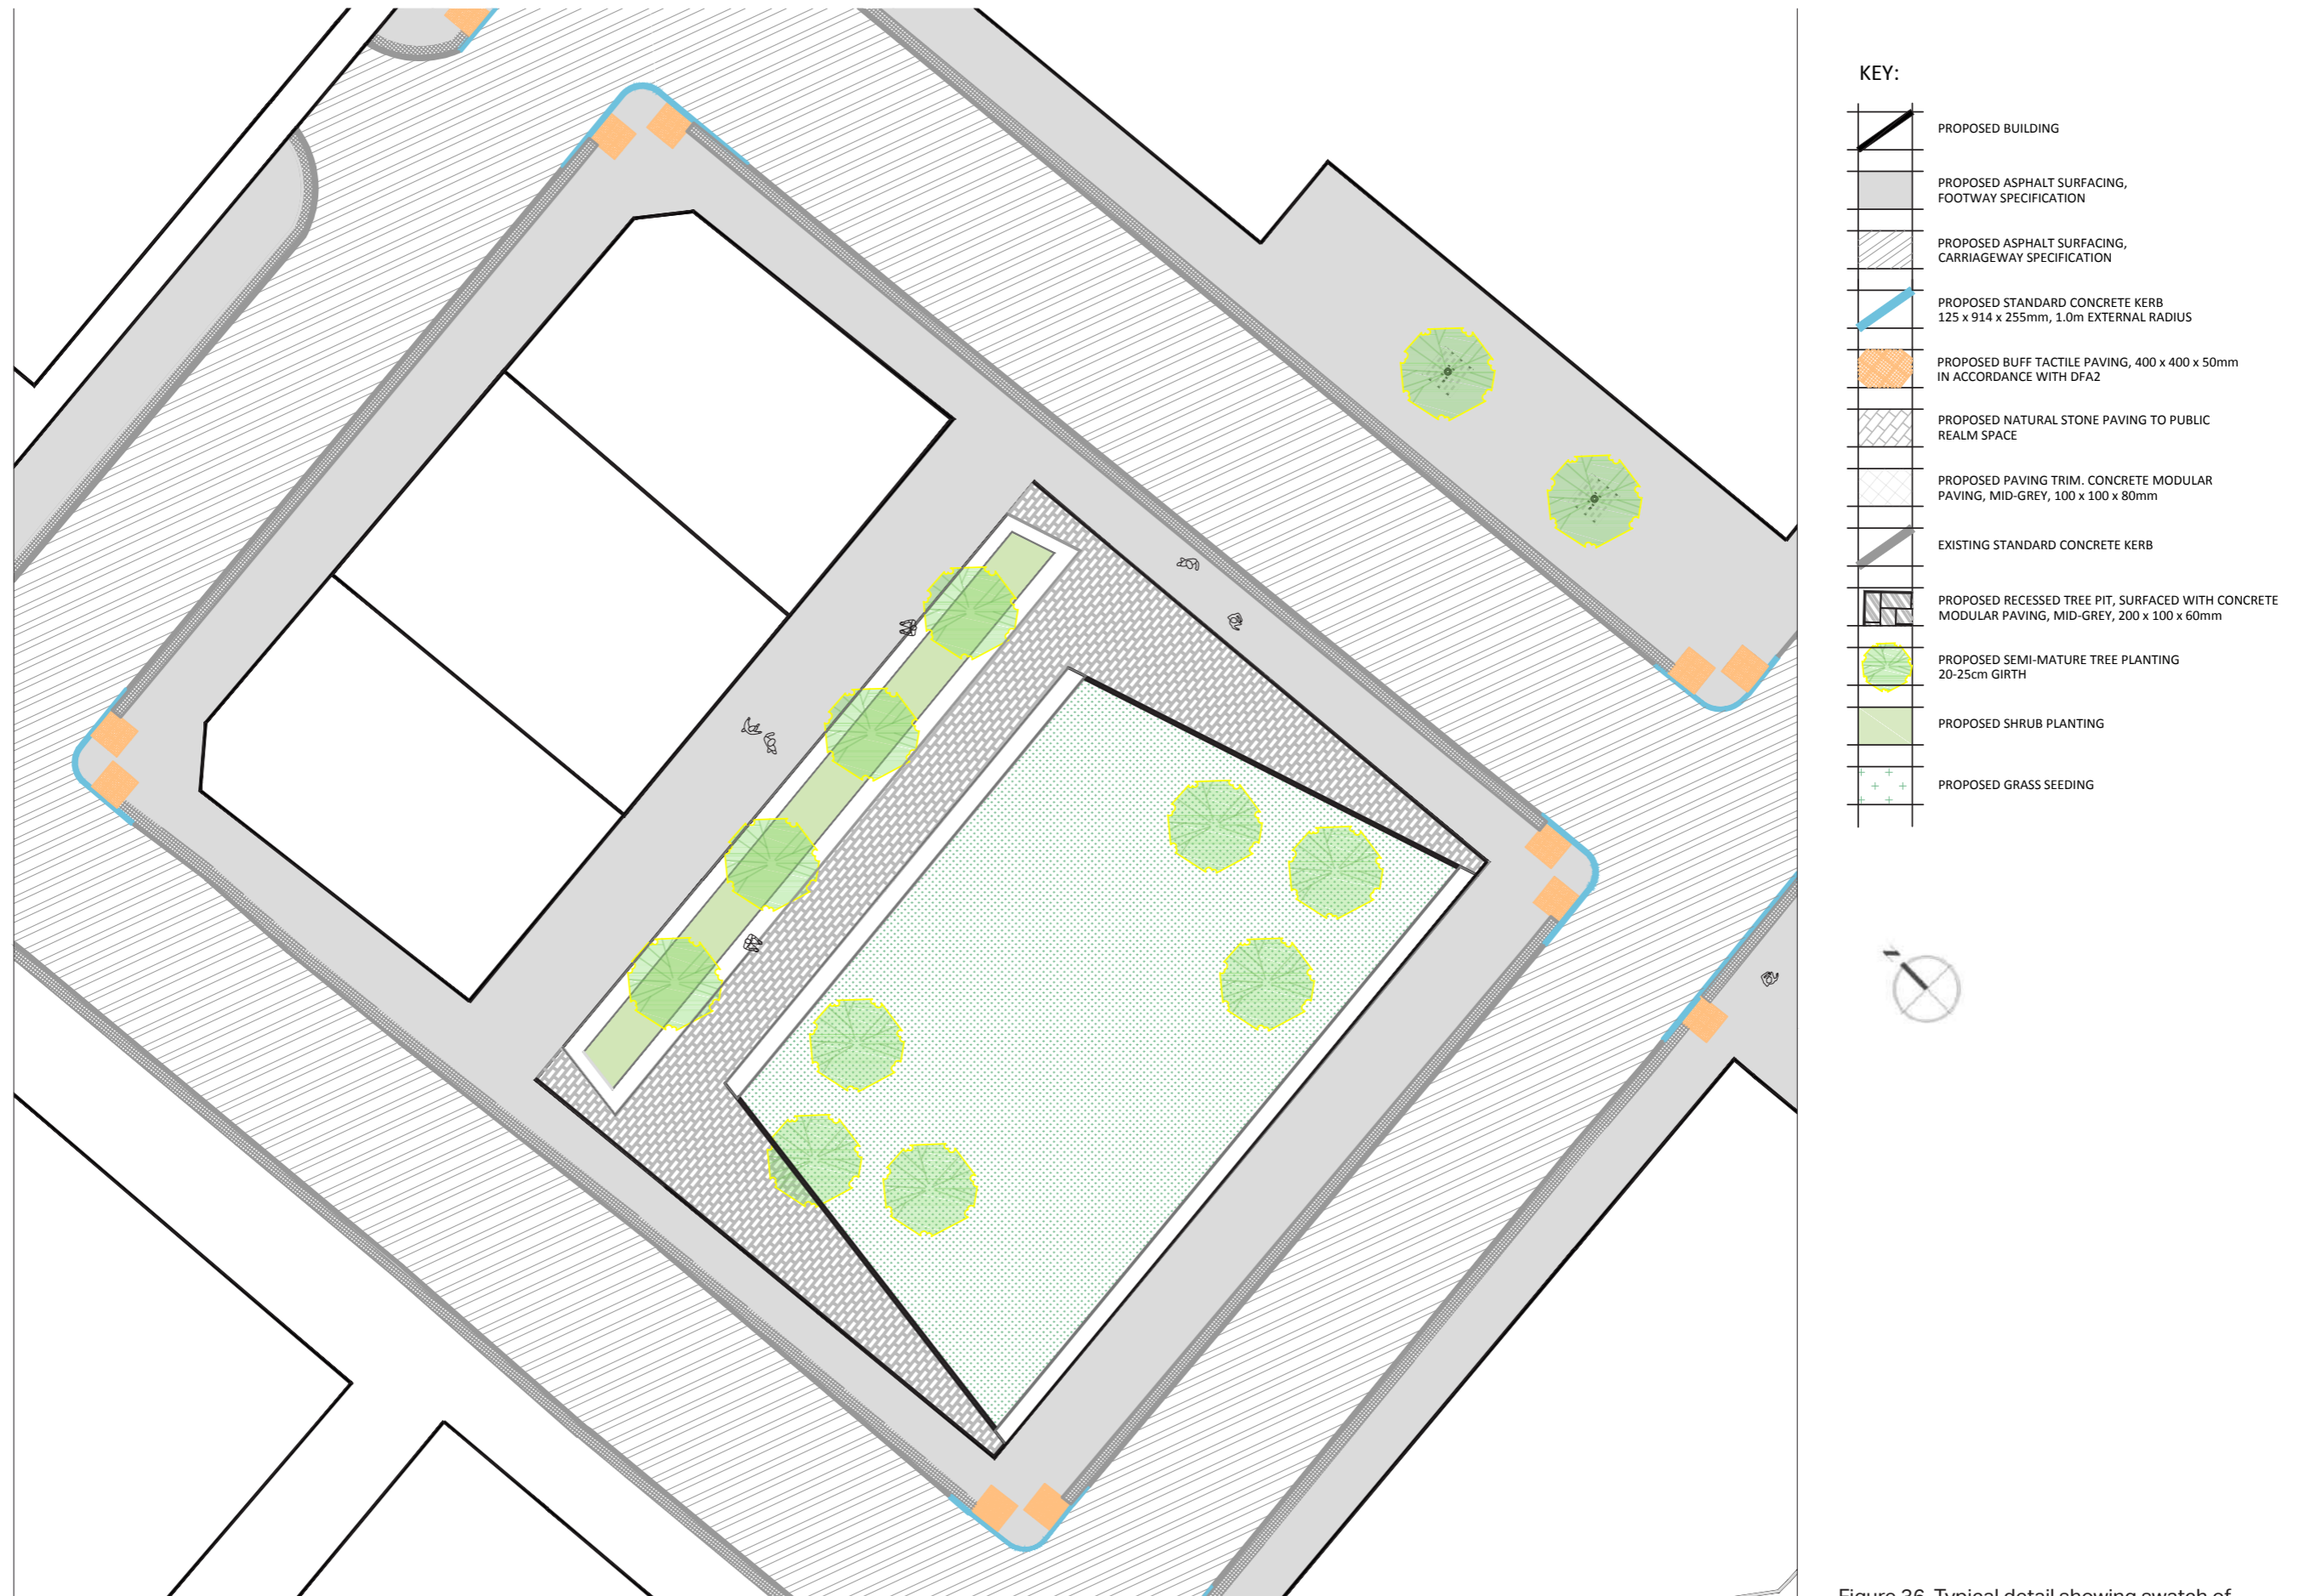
Typical detail showing switch of public realm and building plot (not to scale)
